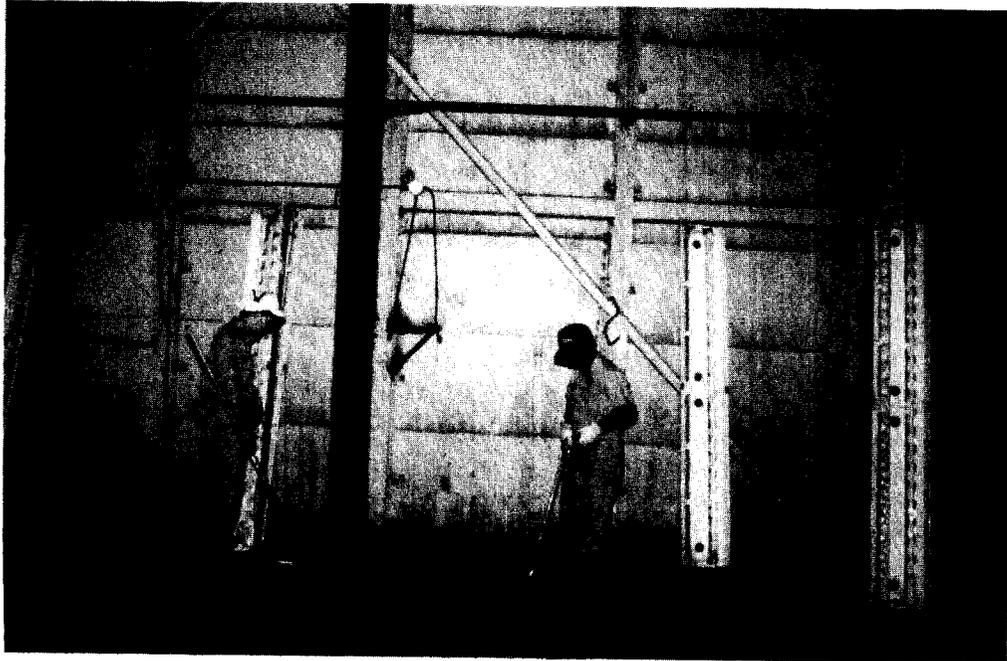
View of northwest wall in the New Betatron Building, Granite City Steel facility.
